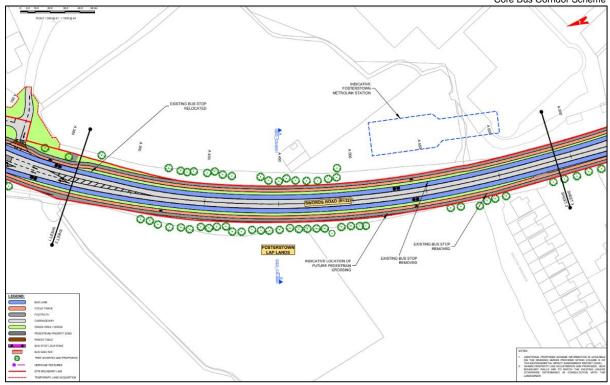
Extract from General Arrangement Drawing (Sheet 2)
